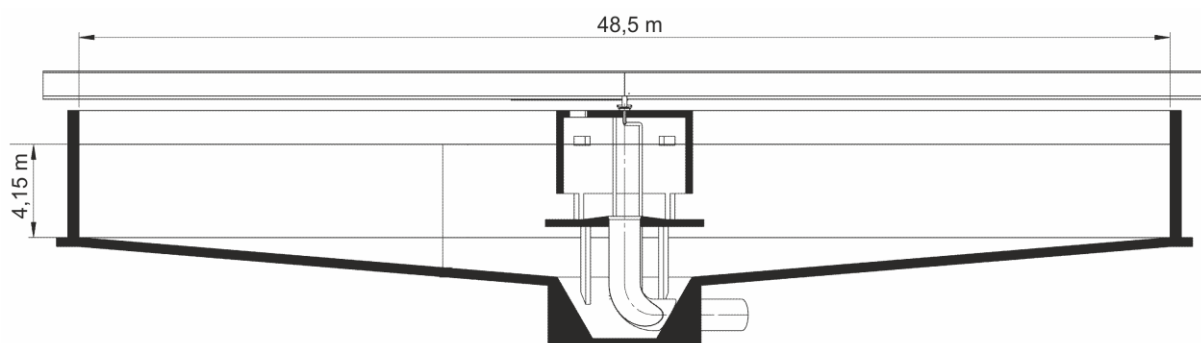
Secondary clarifier of the Dresden-Kaditz wastewater treatment plant. Cross section.
